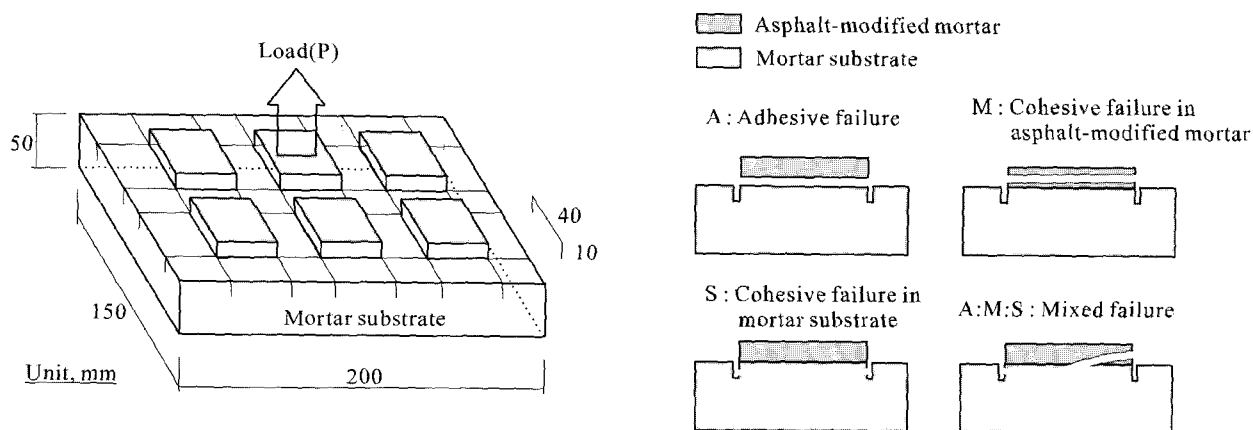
Adhesion test in tension and types of failure modes of specimens.
